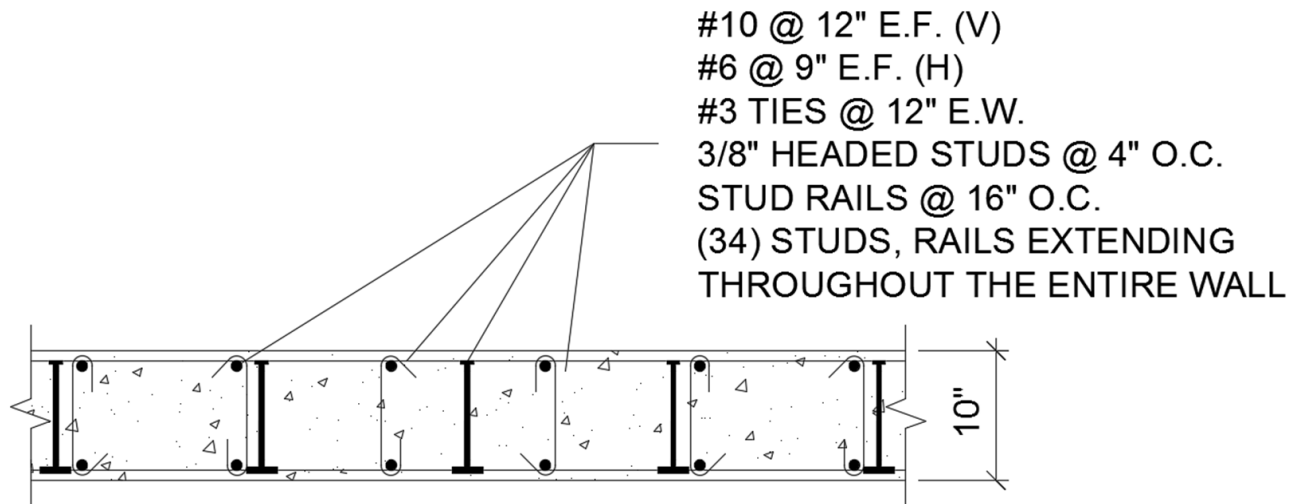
New exterior wall, cross-section at the ground floor level based on tsunami design requirements.
